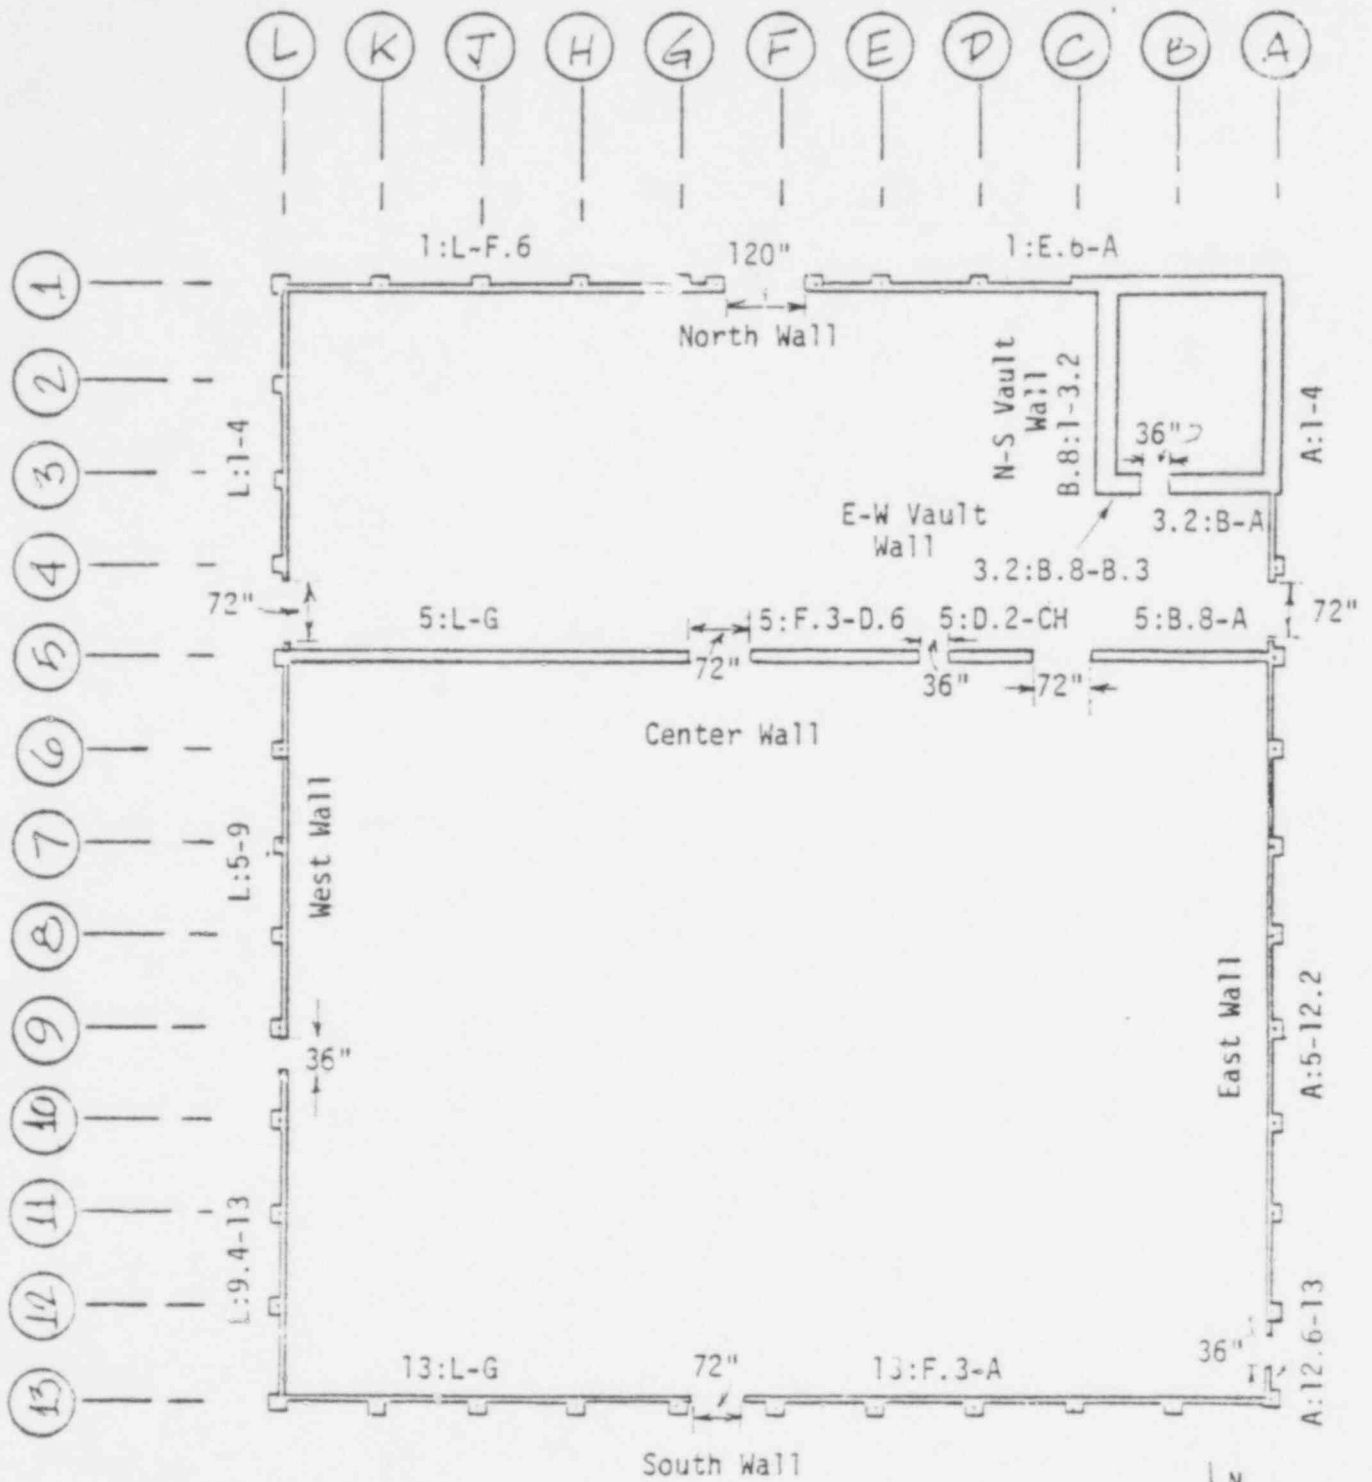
(a). 1st. STORY STRUCTURAL WALL ELEMENTS
